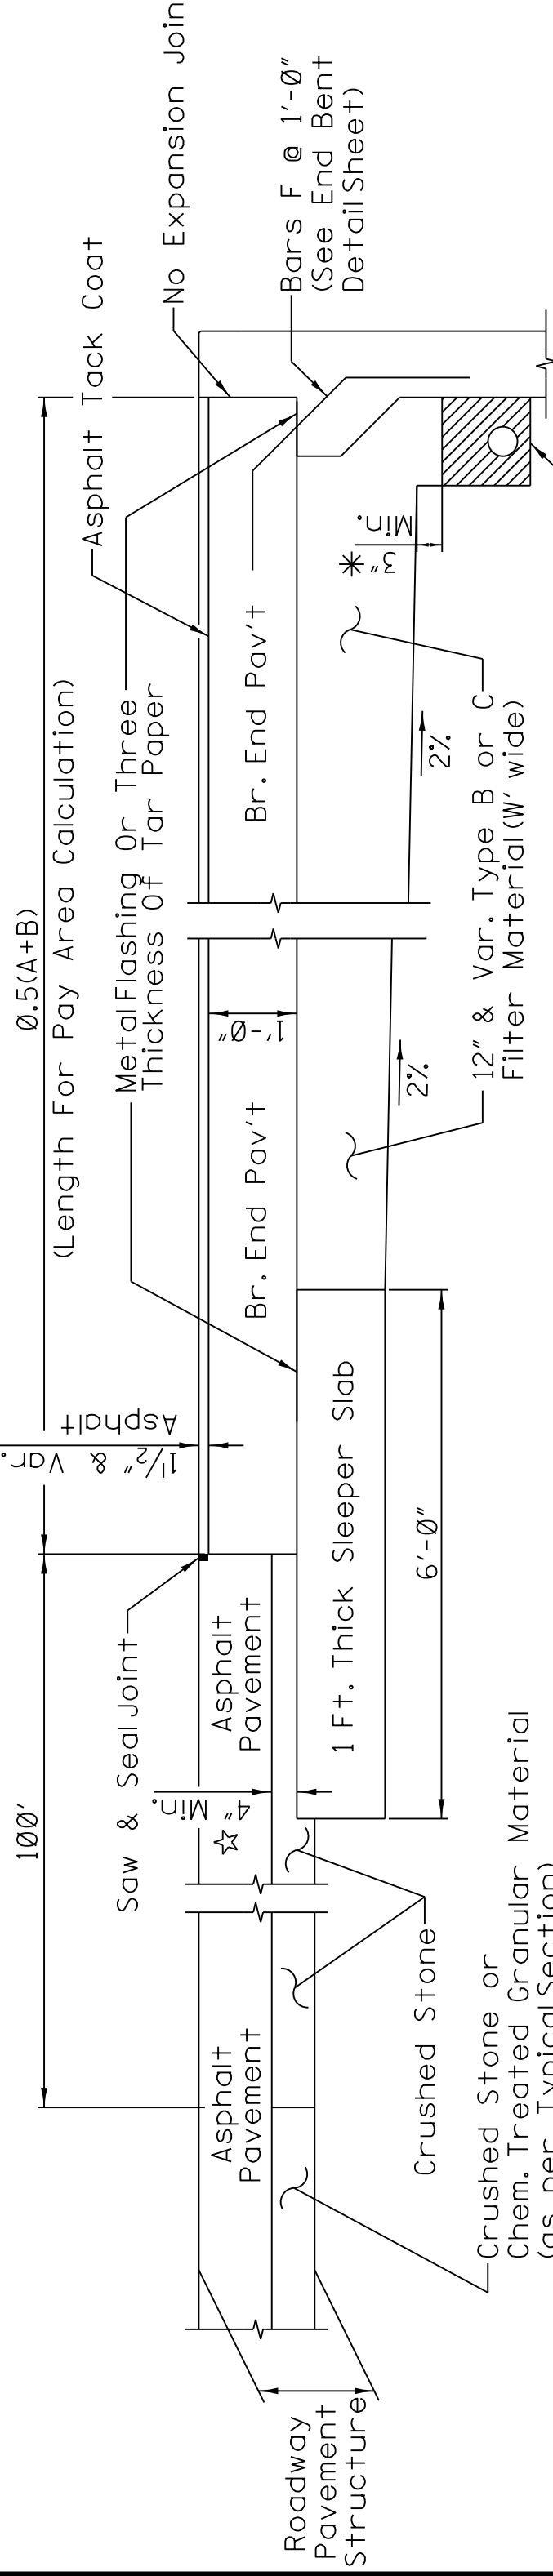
DETAIL SHOWING METHOD OF SEATING BRIDGE END PAVEMENT ON BRIDGES WITH NO PAVING BRACKET
